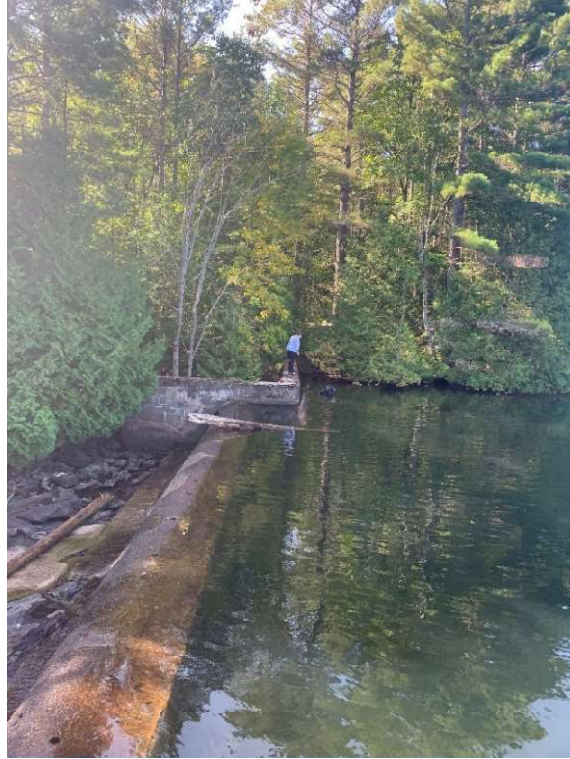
Snorkel Survey along west face of south wingwall and overflow dam
